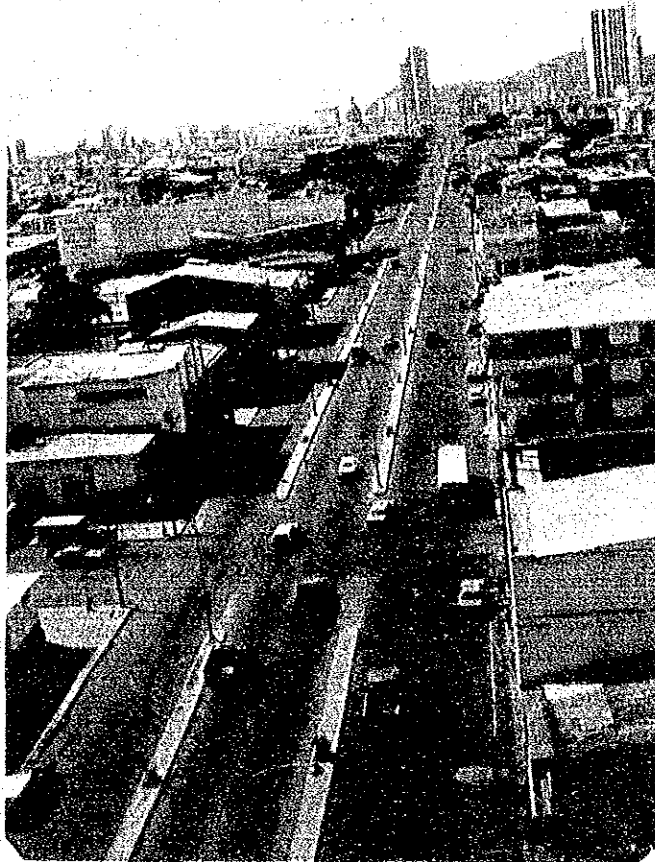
TYPICAL PRESENT CROSS - SECTION
